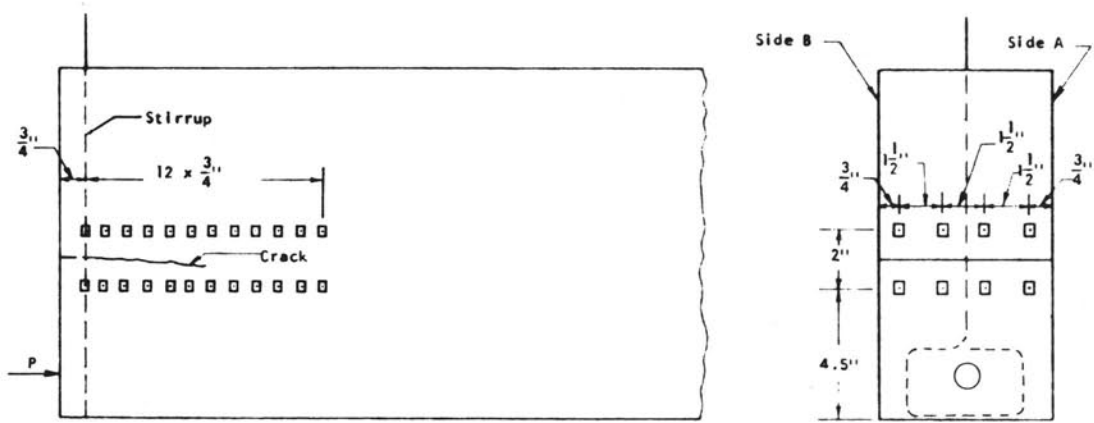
TYPICAL GAGE POINT ARRANGEMENT FOR THE MEASUREMENT OF CRACK WIDTH WITH 2-IN. BERRY GAGE
